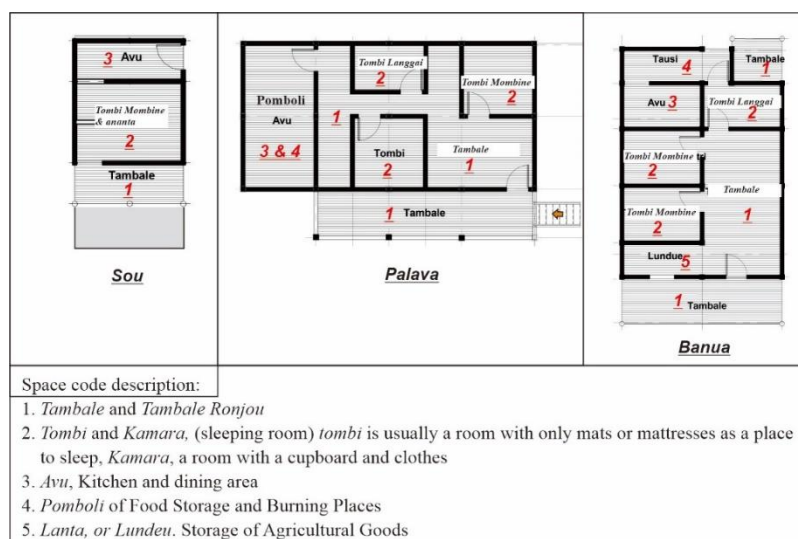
Existing floor plan of residential examples: *Sou*, *Palava*, and *Banua
